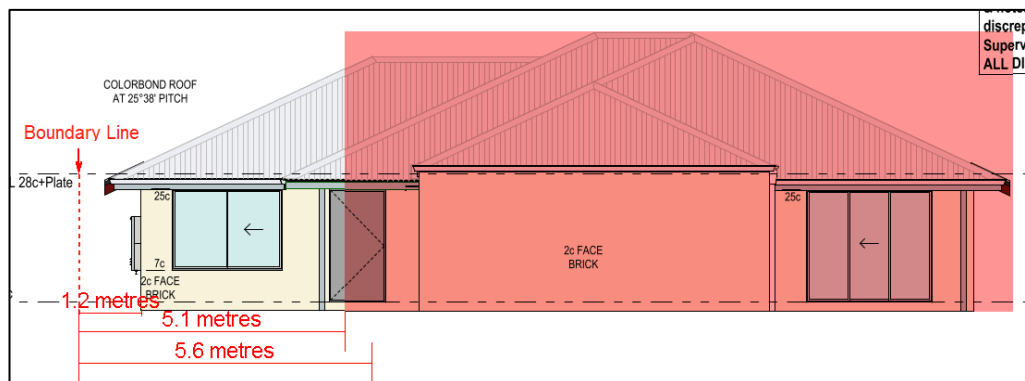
Street view elevation of proposed dwelling with obscured view - highlighted red
